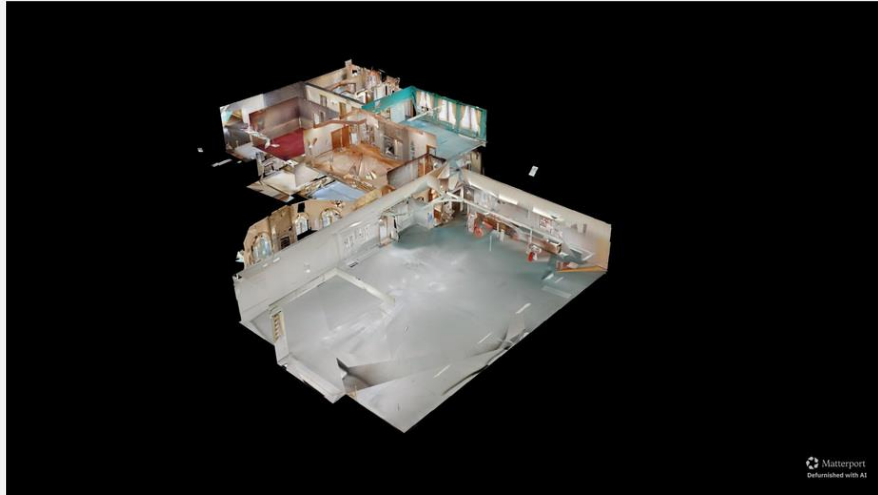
| Matterport Dollhouse View of Interior Layout
